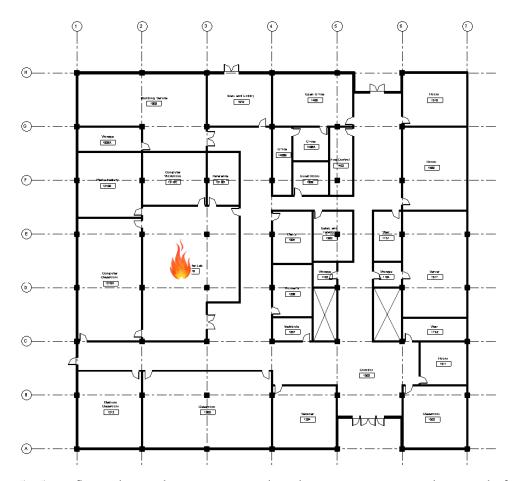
A floor plan with 30 rooms used in the test cases. Two elevator shafts are excluded from the 30 rooms assuming that elevators are not used during building fire evacuation. The flame icon denotes where the fire started.
